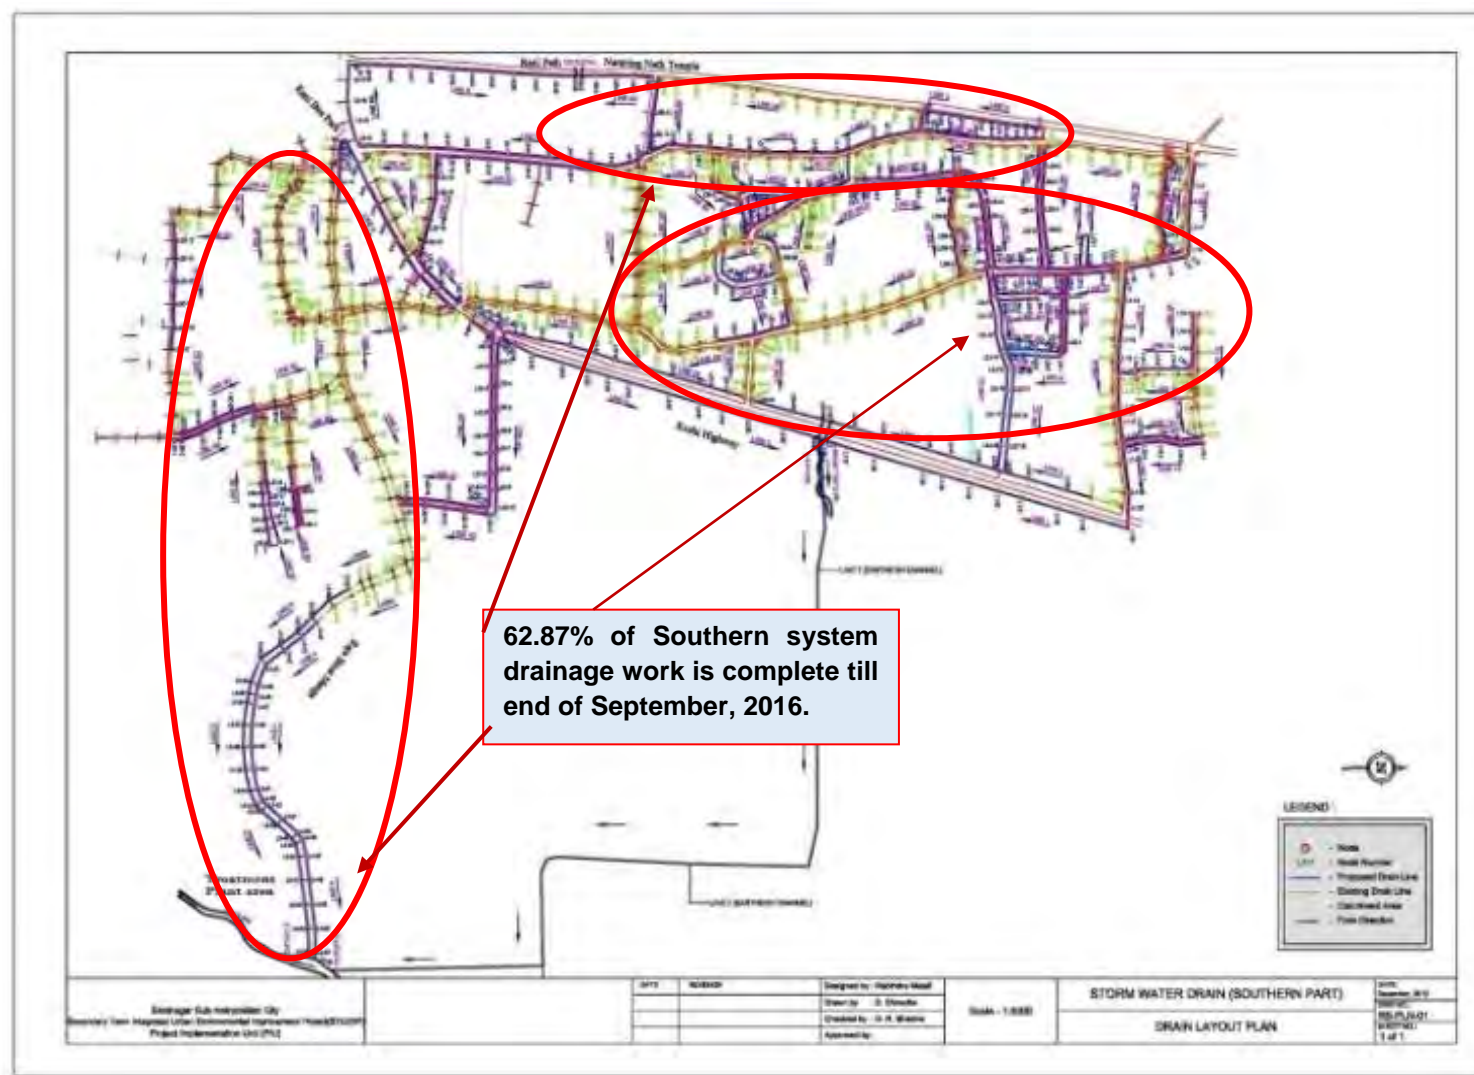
Proposed Storm Water Drains in BSMC (Southern Drainage System)
